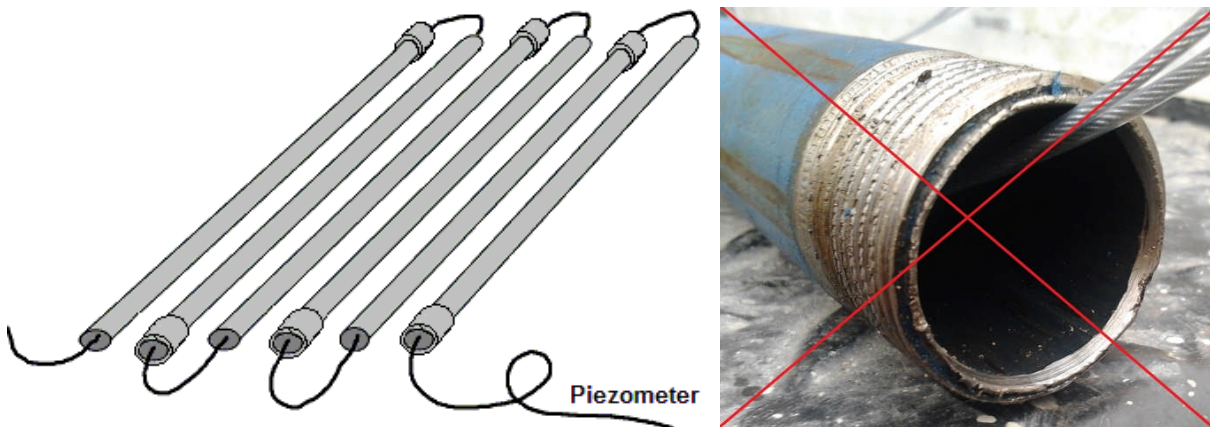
Thread the cable through rods/pipes – do not forget the joints. Only use high-quality pipes free from sharp edges and burr.
